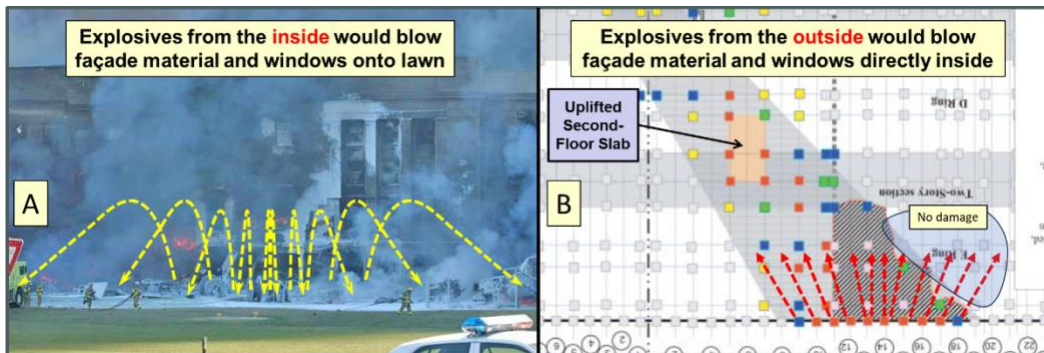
Internally placed explosives would blow outward (left) while externally planted explosives would blow material inward to the right and left (right) which is inconsistent with the observed damage path toward the “C-Ring Exit Hole.”
